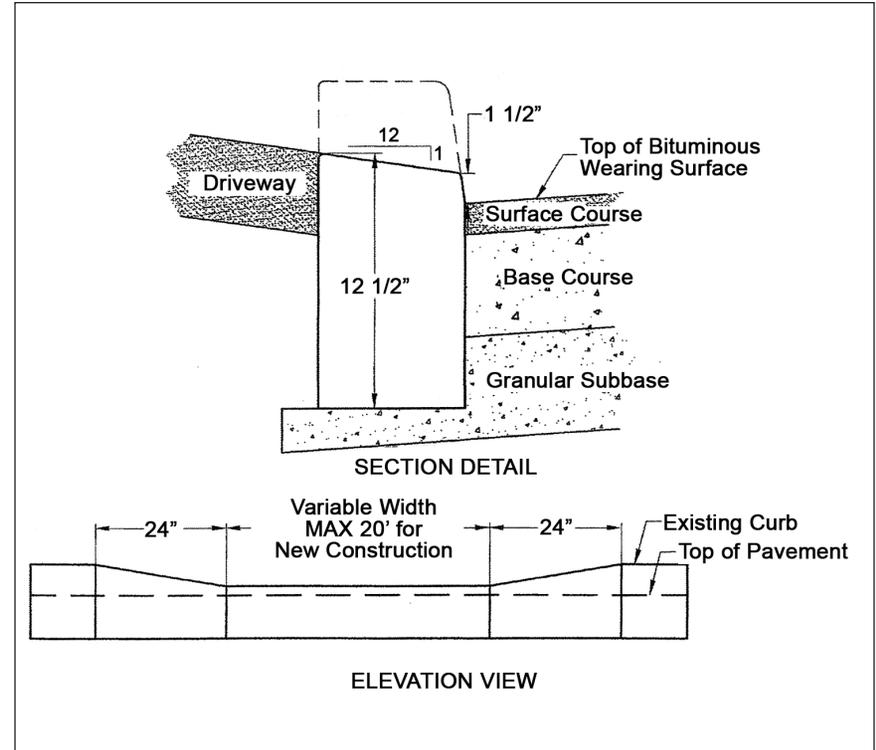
Driveway Curb-cut Detail for Full Depth Vertical Face Curb
